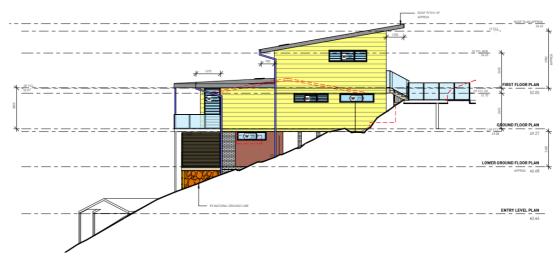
Proposed South Elevation Source: Giles Tribe Architects
